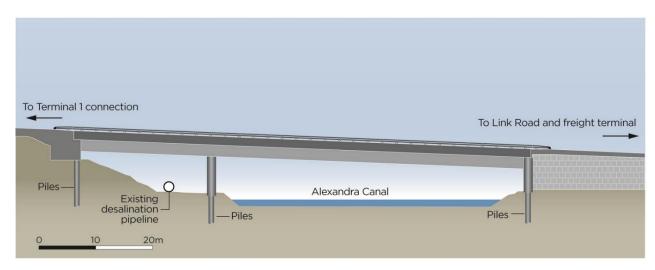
Preferred steel box girder bridge for the freight terminal access bridge
